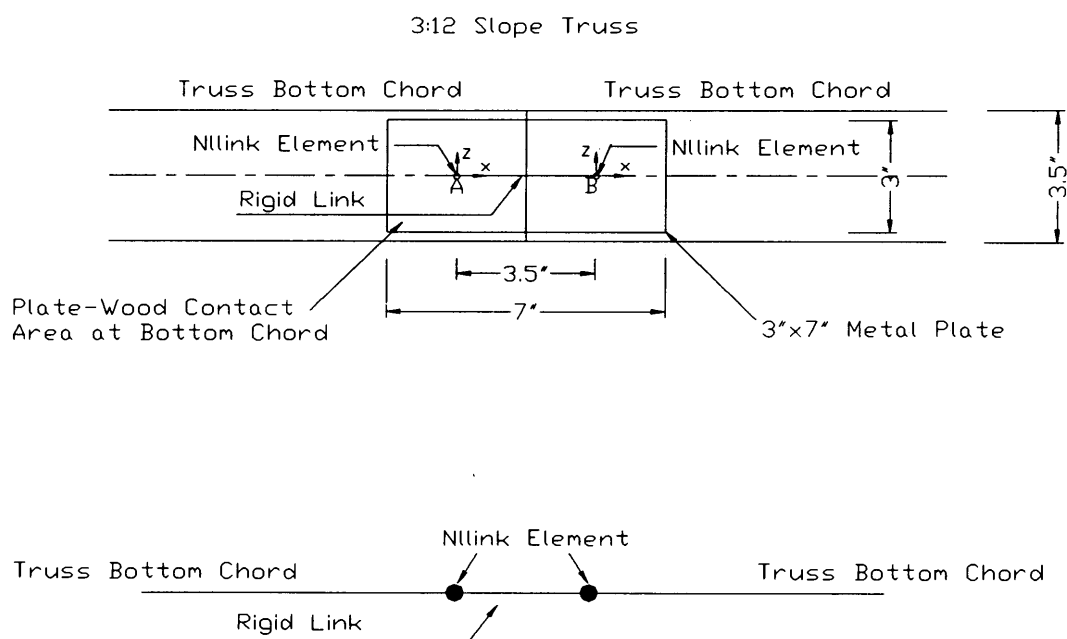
Bottom Chord Tension Splice Joint Detail in 3:12 Slope, 28-Foot-Span, Semi-Rigid Truss Model with 3" x 7" Metal Plate Using Linear Spring Elements
